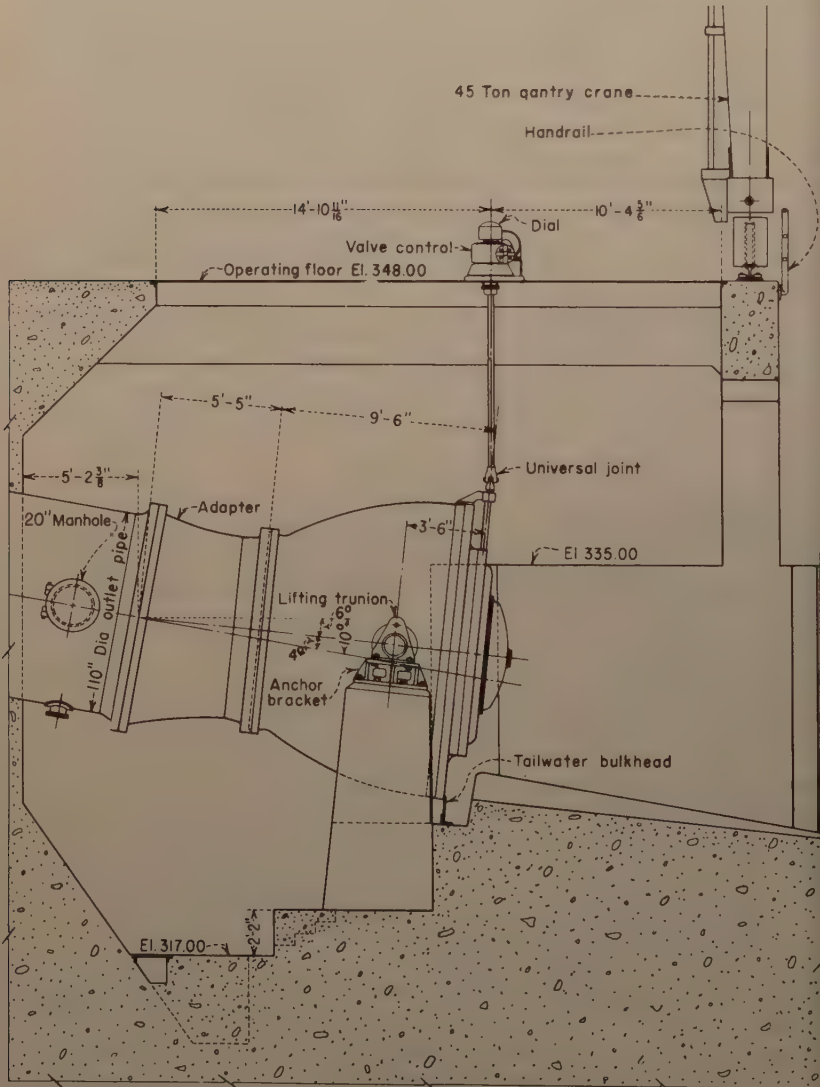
96-INCH HOLLOW JET VALVE INSTALLATION
